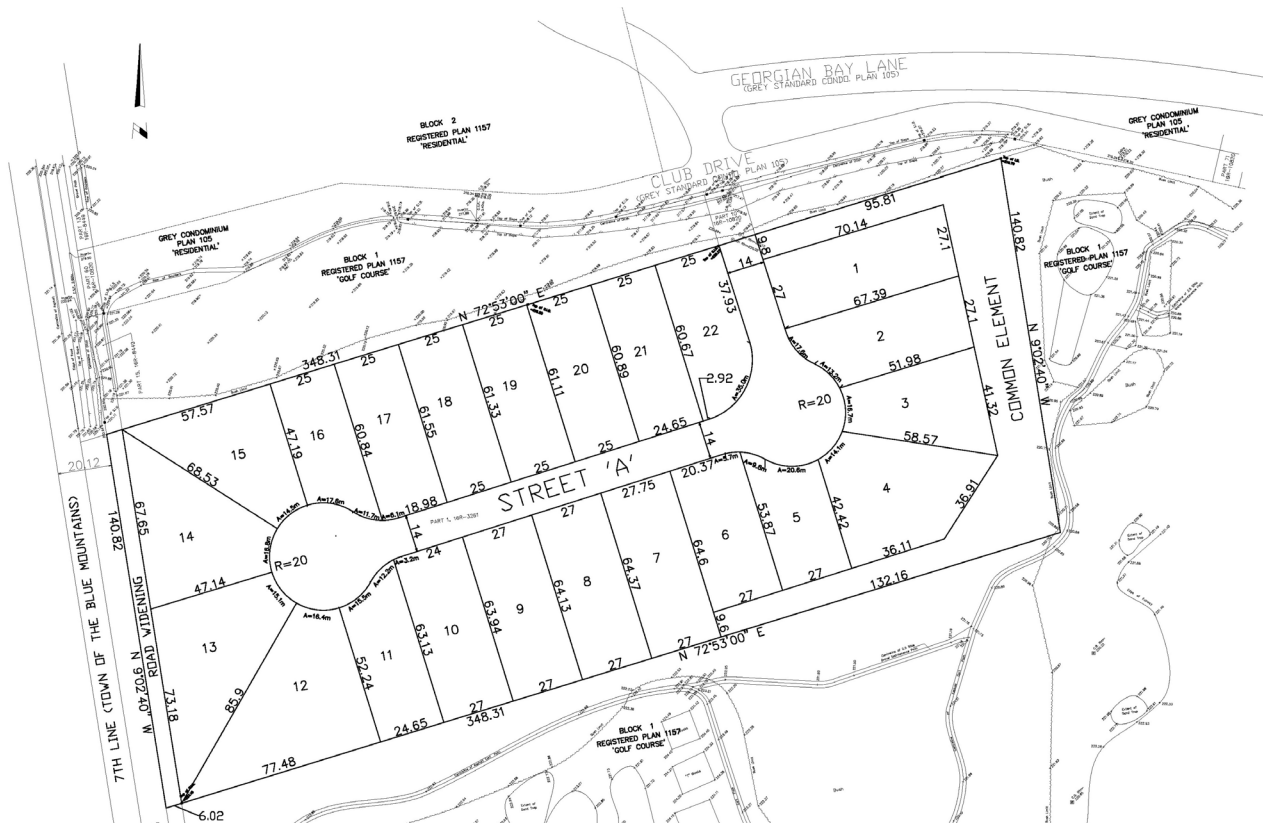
Draft Plan of Vacant Condominium (Tatham Engineering, 2023)
